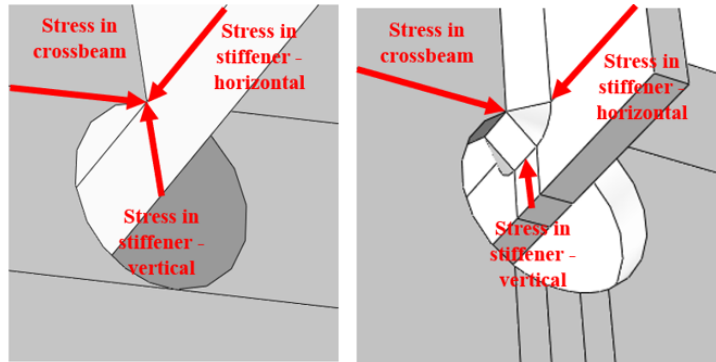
The two regions of interest based on cracks in crossbeam and cracks in stiffener
